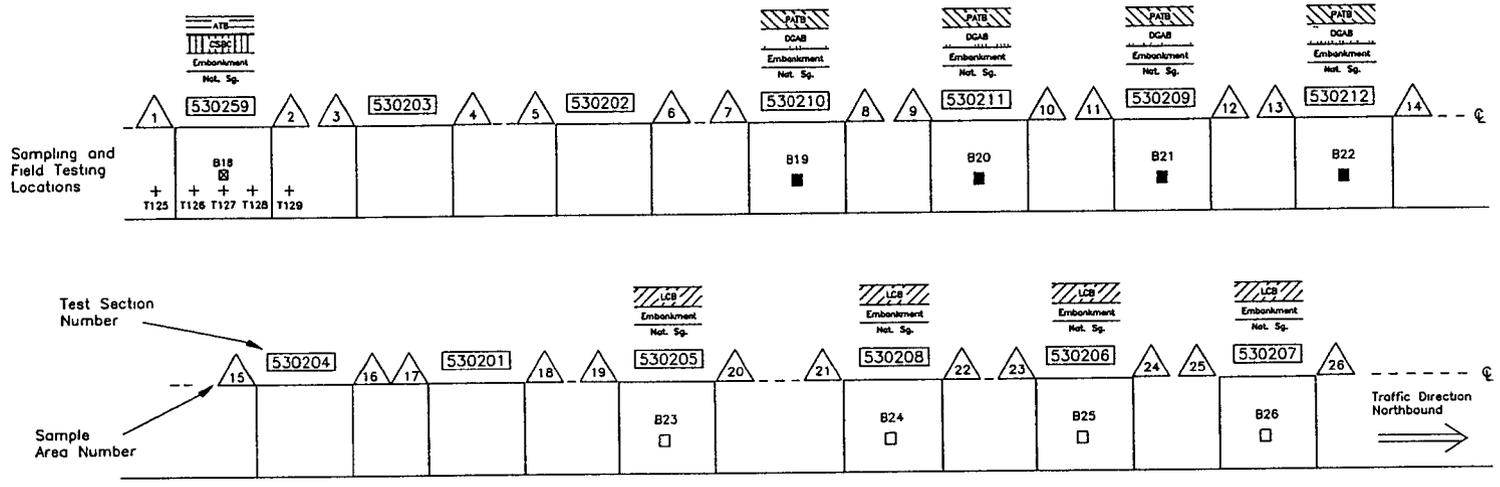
Overview of material sampling and testing on Prepared Subgrade or Embankment, SPS–2 Washington
